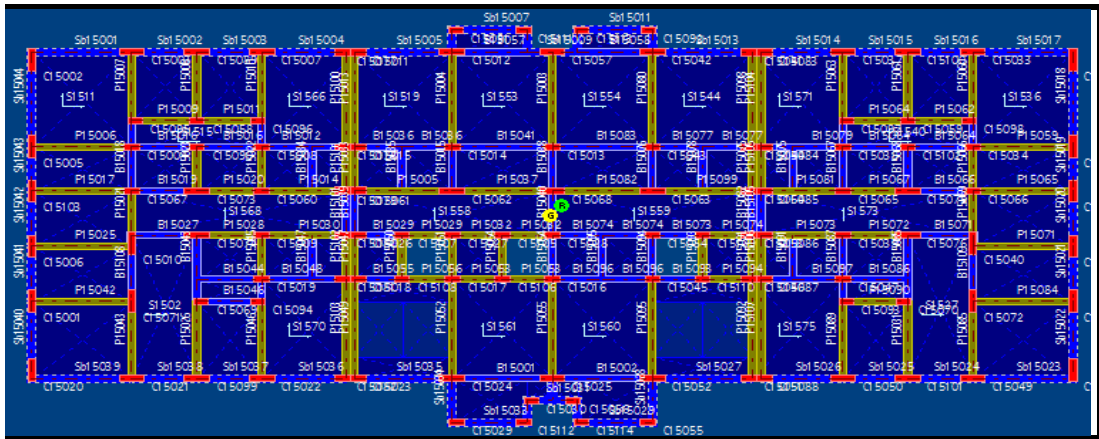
Plan of Fifteen Stories and Tunnel Formwork System
